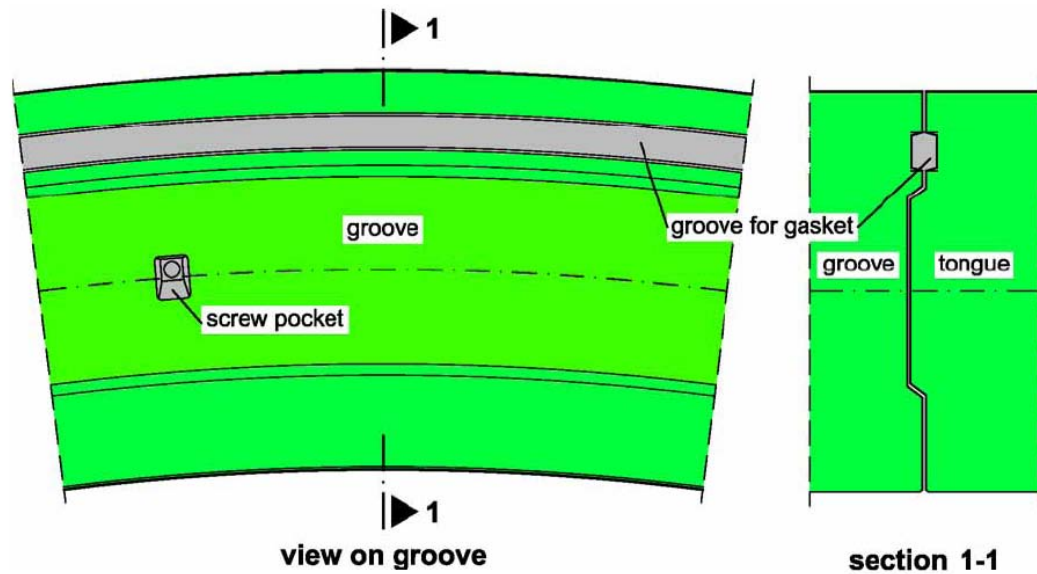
Circumferential joint with tongue-and-groove system [14]
